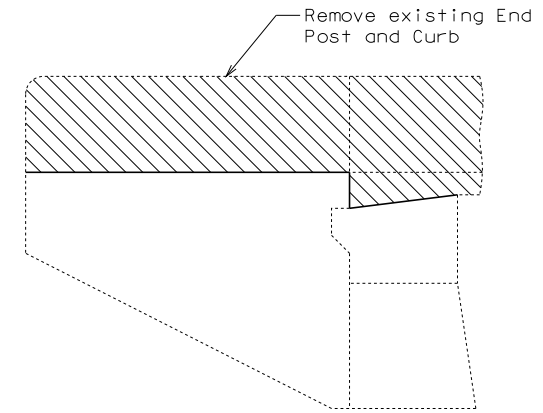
DETAILS OF CONCRETE REMOVAL @ END BENT NO. 1
